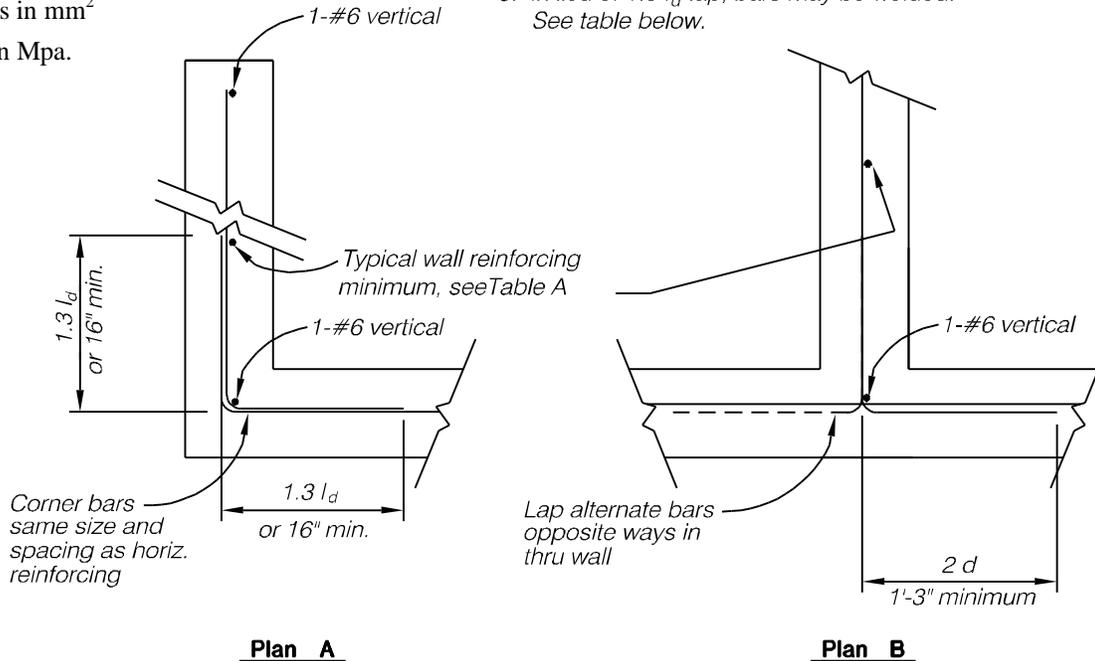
Minimum concrete shear wall reinforcement (two curtains)
